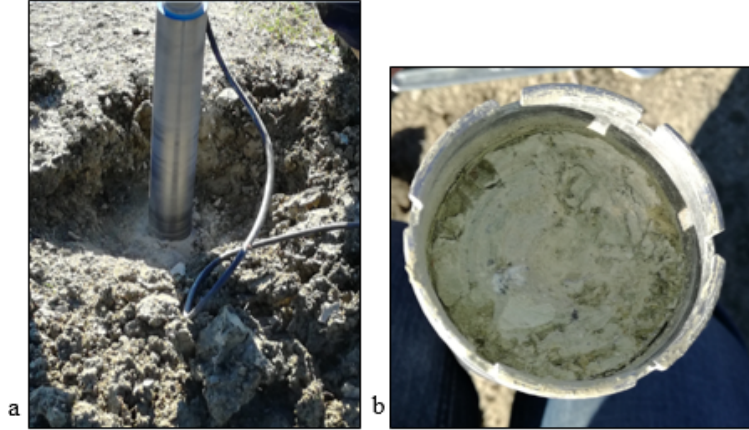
a) the diamond core drill used to extract intact core specimens; b) the core get stuck in the drill bit.
